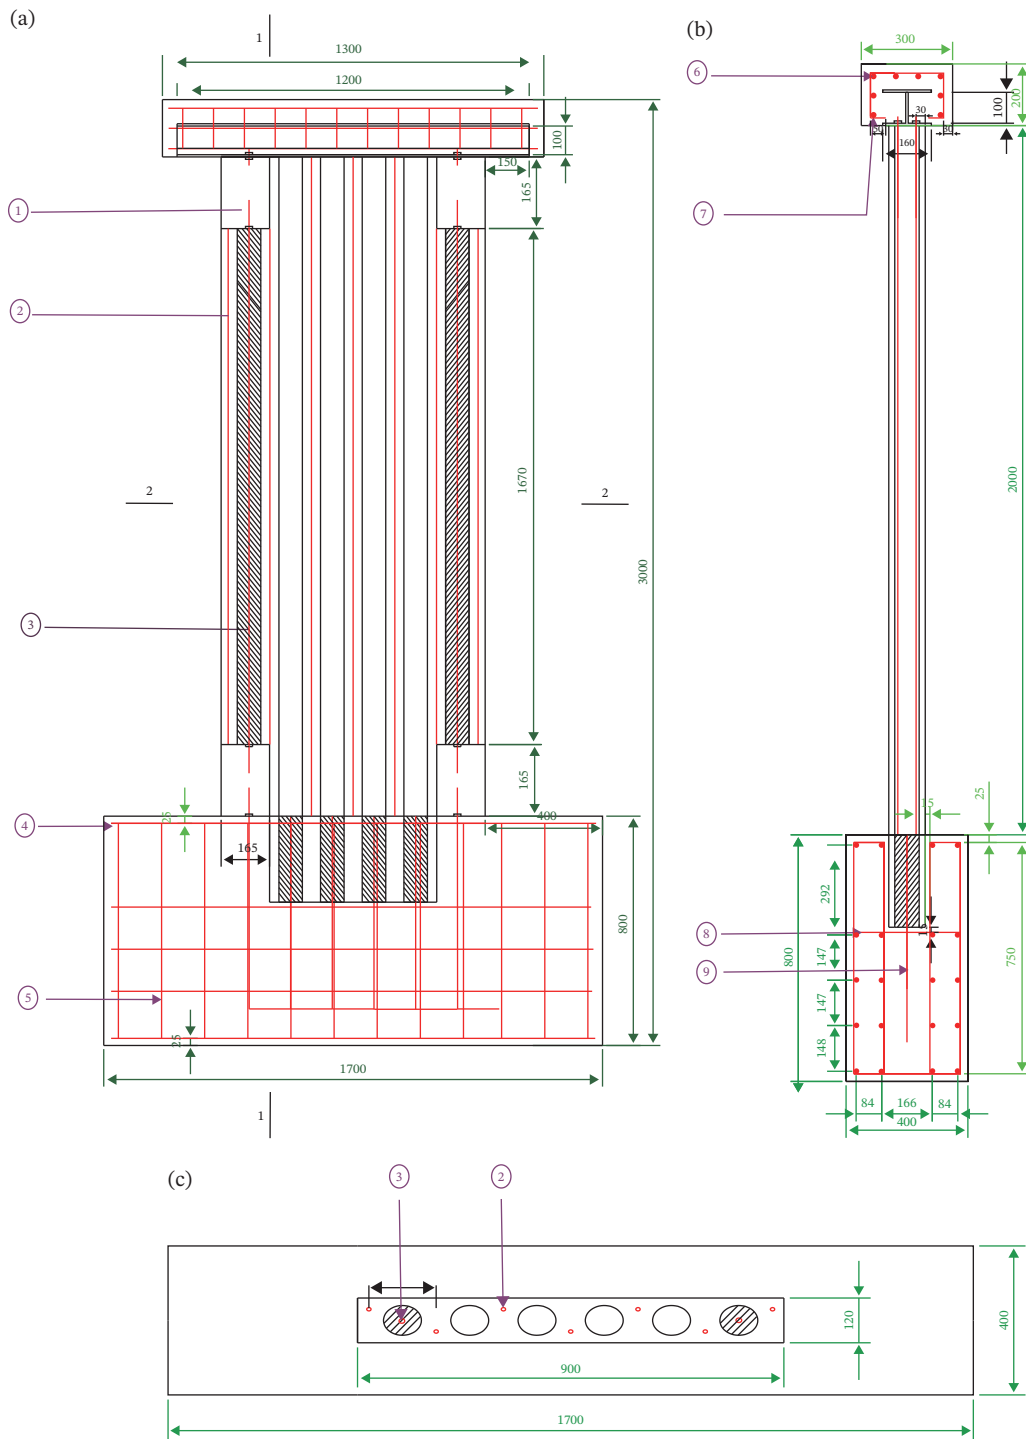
| Hollow slab wall diagram. (a) front view, (b) 1–1 profile, and (c) section 2–2. ① Perforated reinforcement C12, ② internal reinforcement C9.3@142, ③ Concrete pouring hole C12, ④ transverse rib 20C16, ⑤ hooped reinforcement C8@150, ⑥ transverse rib 20C16, ⑦ hooped reinforcement C8@150, ⑧ hooped reinforcement C8@150, and ⑨ anchored reinforcement C12.
